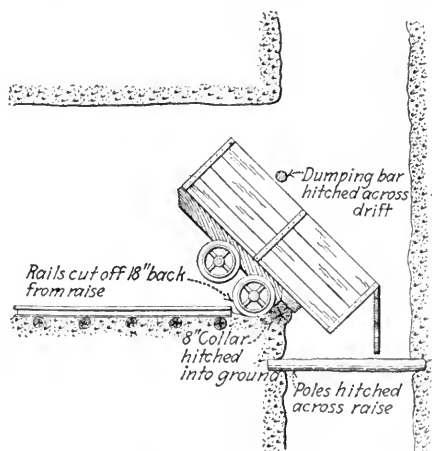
SIMPLE FIXED DUMPING ARRANGEMENT.
